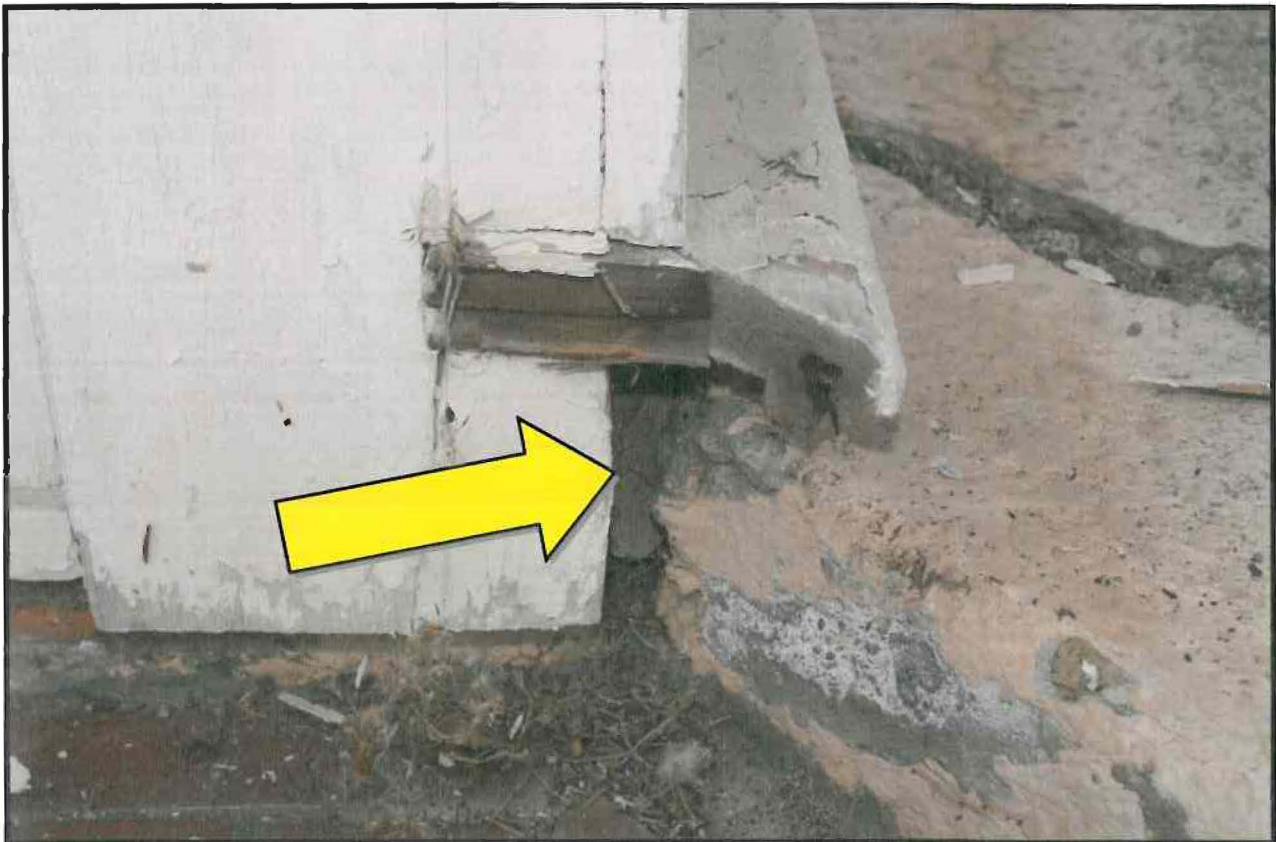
Photo D - Photo showing new concrete patio slab poured and encasing wood sill for added window
